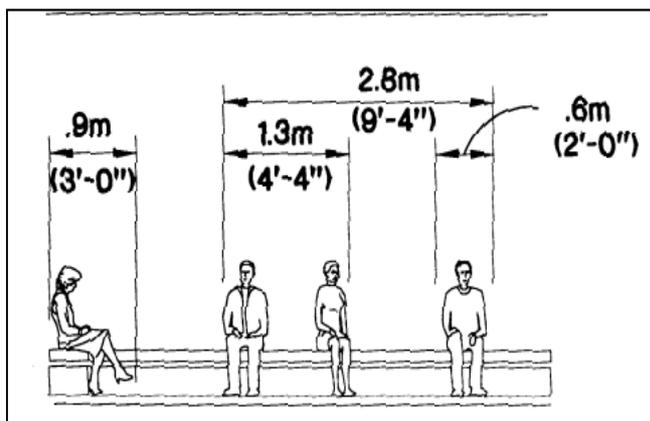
Human dimensions when sitting (Source: Washington State’s Pedestrian Facilities Guidebook, 1997)
